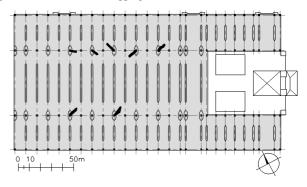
The roofing damage points (worked on materials from [3])
